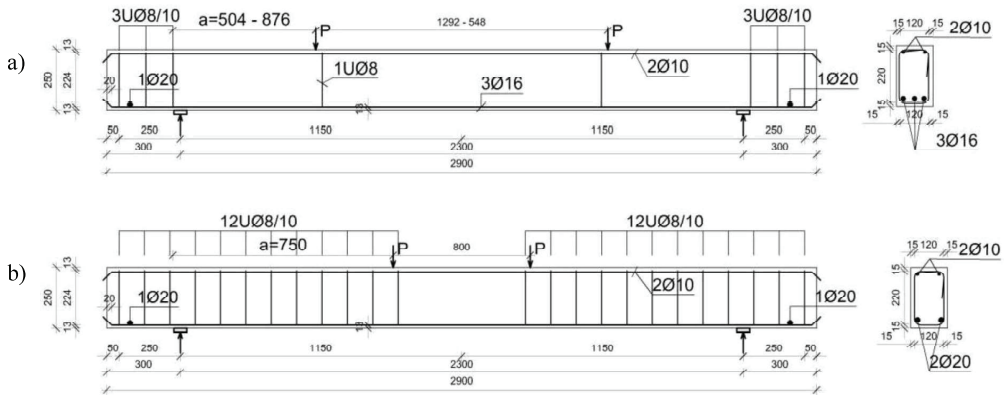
Reinforcement and cross section details for the beams a) without and b) with shear reinforcement
